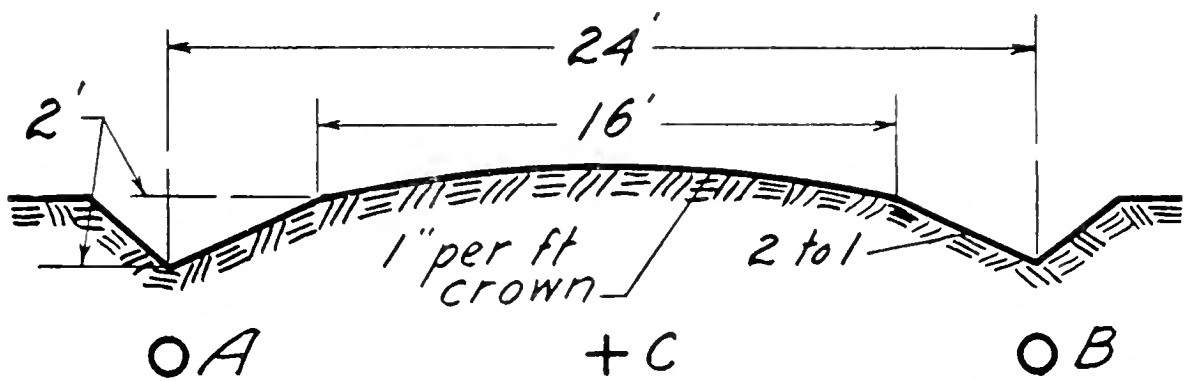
Cross section showing methods of drainage. A roadbed should be properly drained regardless of the nature of the surfacing. On land that is thoroughly drained a tile at A or B may be sufficient. On a new road it is desirable to place a tile drain at C, but on an old road this may become very expensive because of the difficulty in digging. In wet, heavy soils or for wide roadways tile should be placed at both A and B. If the tile is placed only on one side of the road, it should be on the side from which the water is coming, in order to avoid seepage. If water is permitted to pass under the roadbed, it will be raised by capillary action and soften the surface, causing the road to settle.
